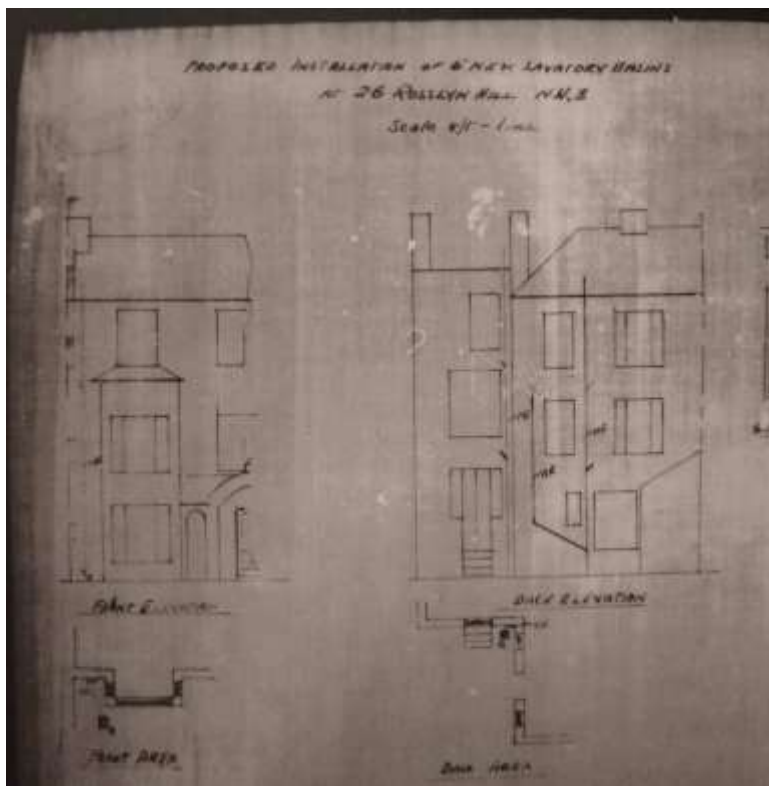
Part of the 1935 Drainage Plans for the subject site.
